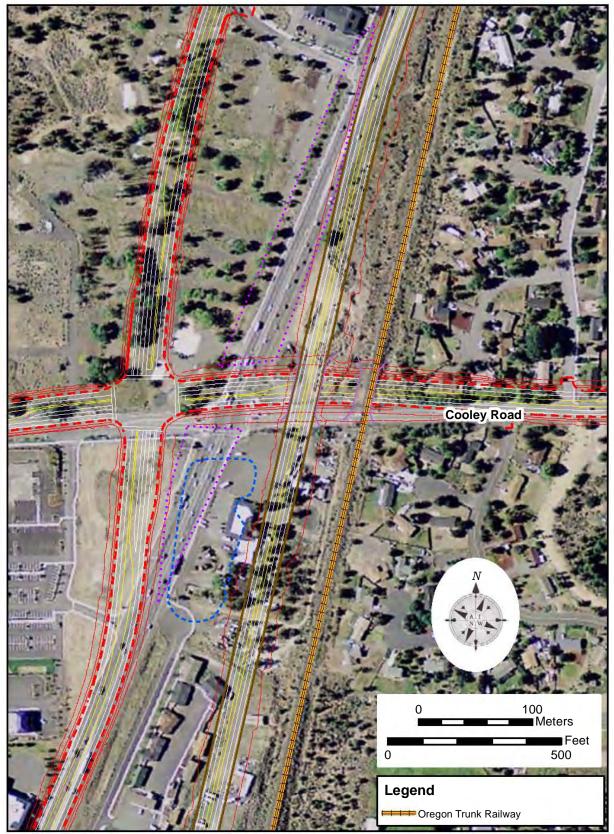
The East DS1 and East DS2 alternatives propose the construction of an underpass beneath the Oregon Trunk Railway at Cooley Road. Proposed modifications would be identical at this location under the two alternatives.
